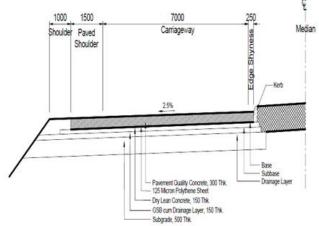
Typical section of the rigid pavement section (Huang, 2004)
